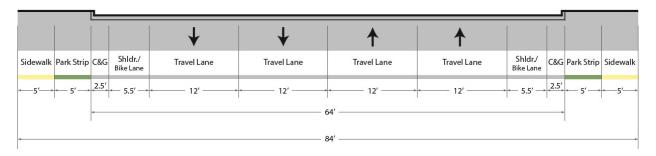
Cross Section, Minor Arterial (Four Lane)
